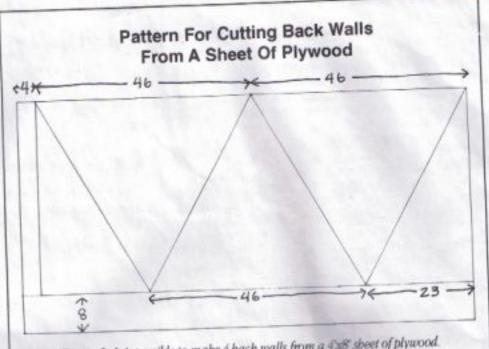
It is possible to make 4 back walls from a 4x8 sheet of plywood.
